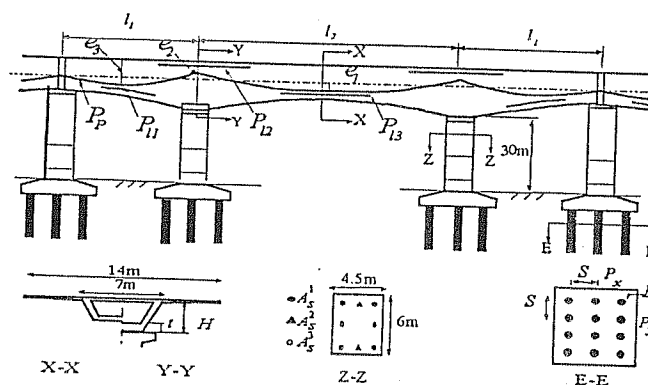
A three-span continuous prestressed concrete bridge system and design variables
